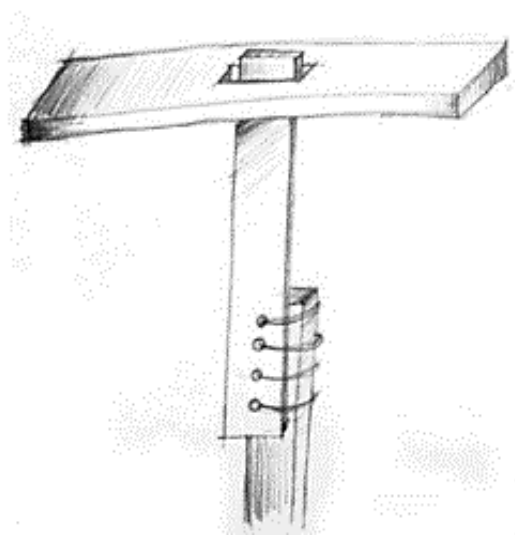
Sketch of the construction supporting the ridge of the Arkovazi tent, column, its plank extension and ridge beam supporting the fabric, drawing by author
